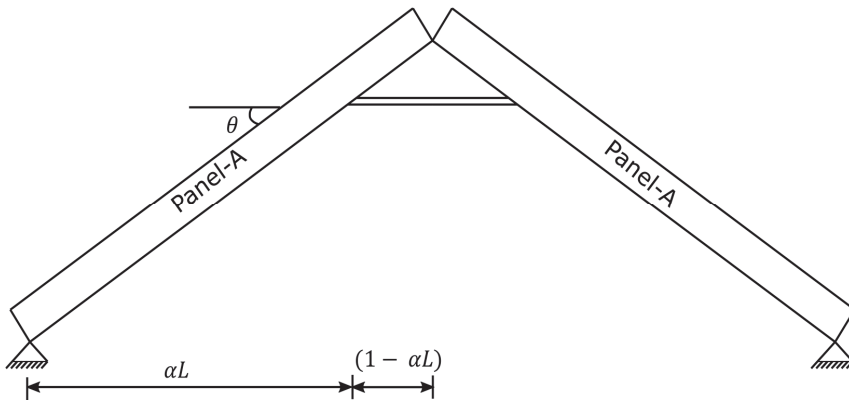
The apex connection idealized as rafter support system eave support with Collar Strut.
